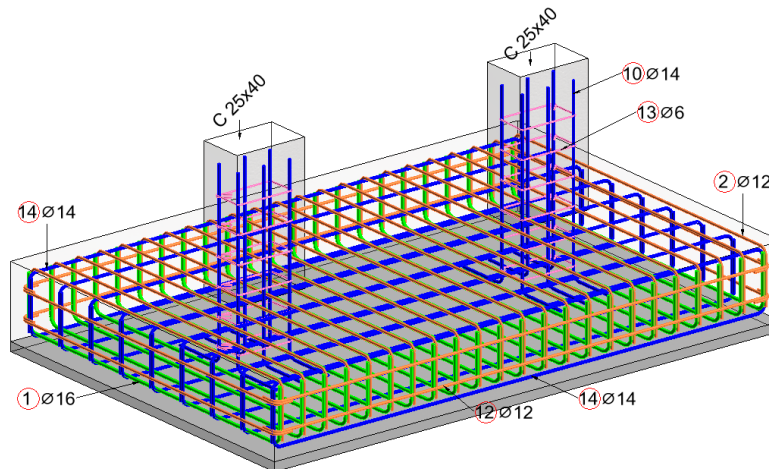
76. 3D view of the steel reinforcement combined foundation
